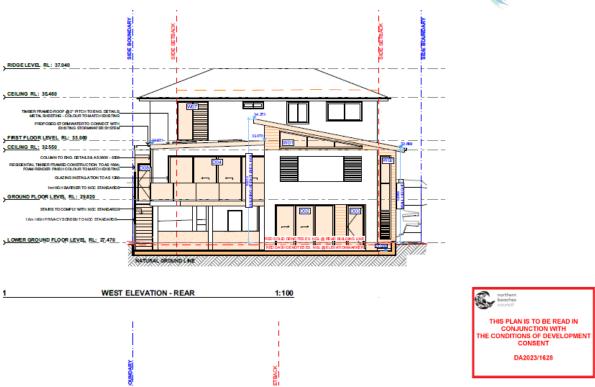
Extract from Stamped Approved Plans showing the Rear Elevation (DA11)
